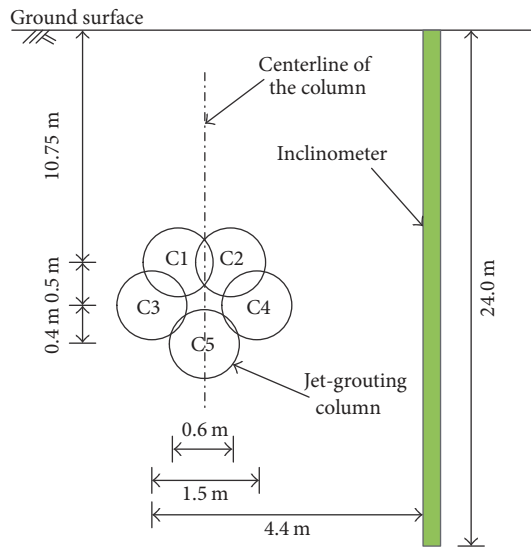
Sectional view of the layout of ground settlement gauges and inclinometer (group column installation case).
